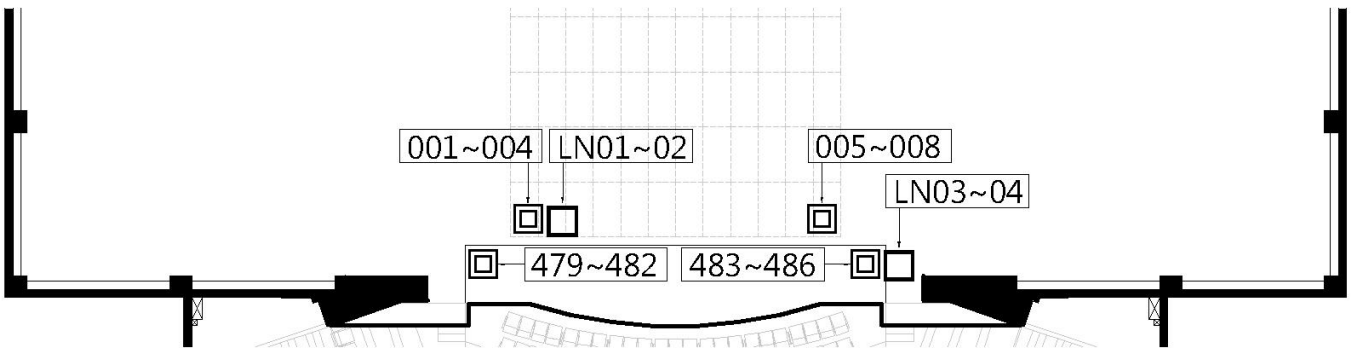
Stage Traps Room and Orchestra Pit Elevation Platform Circuit Layout
